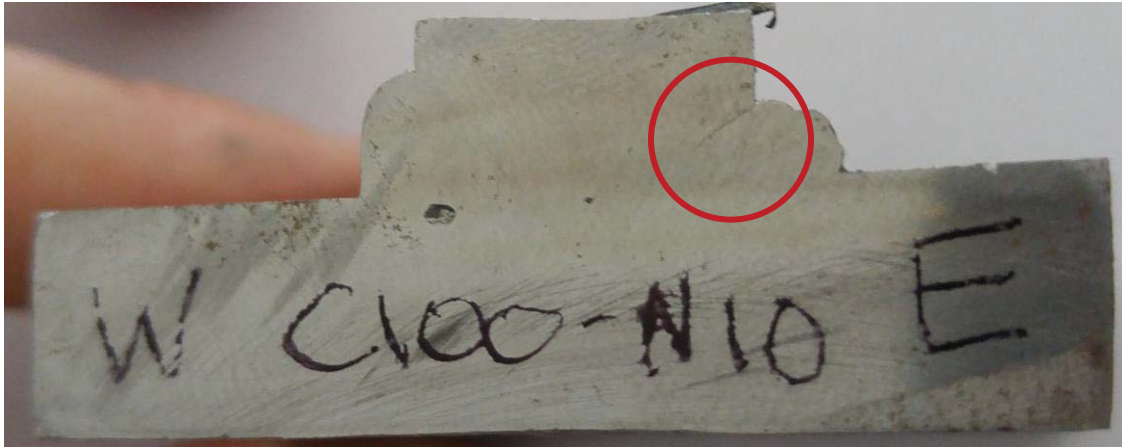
Cross-sectional cut made longitudinally through Stud N10 in Specimen C100.
